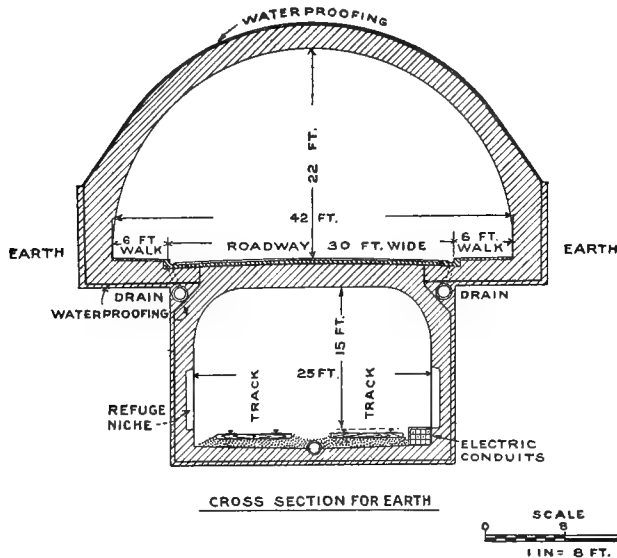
TYPICAL CROSS-SECTION OF MISSION-SUNSET TUNNEL.
